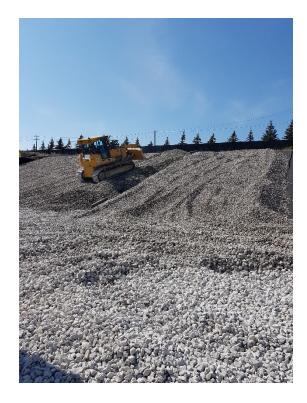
Placement of Clear Stone for the Hydraulic Control Layer
